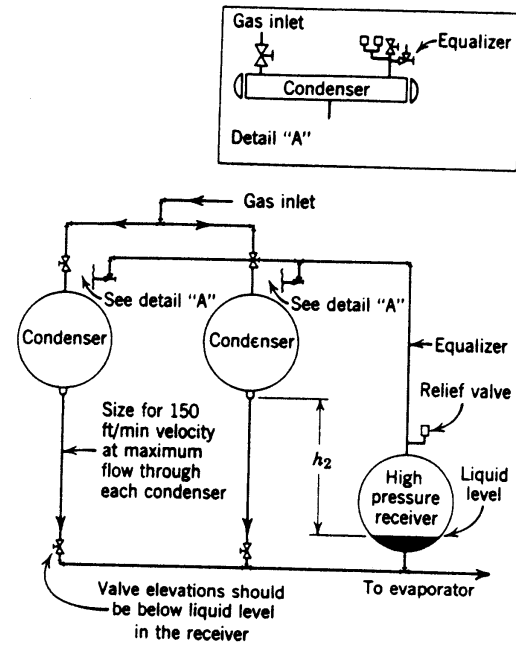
Parallel shell-and-tube condensers with bottom inlet receiver. (Courtesy of York Corporation.)
